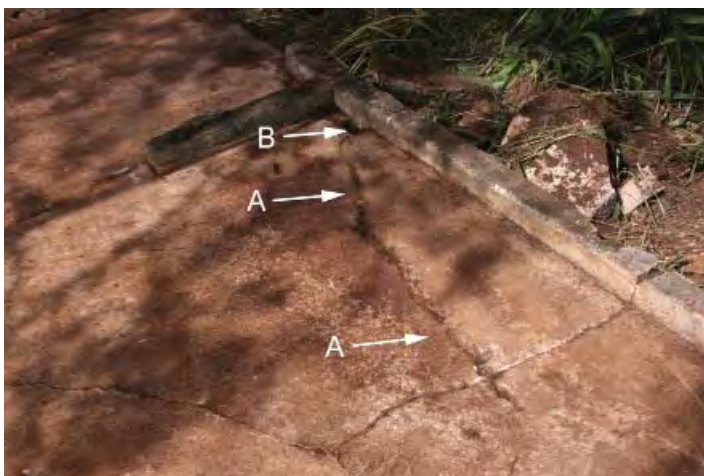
Feature V-26, latrine and shower foundation detail showing chiseled drain (A) and hole through wall (B) (2009).
